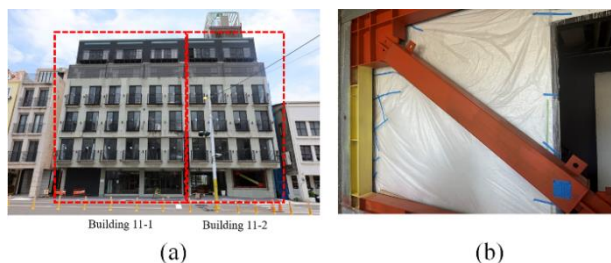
(a) street view of Building A11 and (b) BRB frame within the building.
